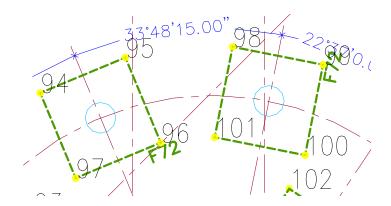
A Sample of Use of AutoCAD for Construction Layout
